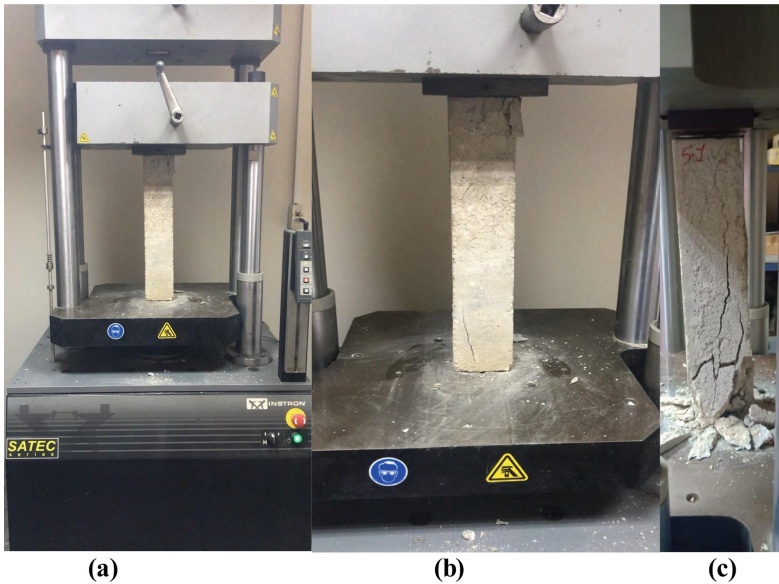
(a) Compression testing of control RC columns (b) initial failure mode through spalling of the upper surface (c) final failure modes showing longitudinal cracks and lower surface spalling
